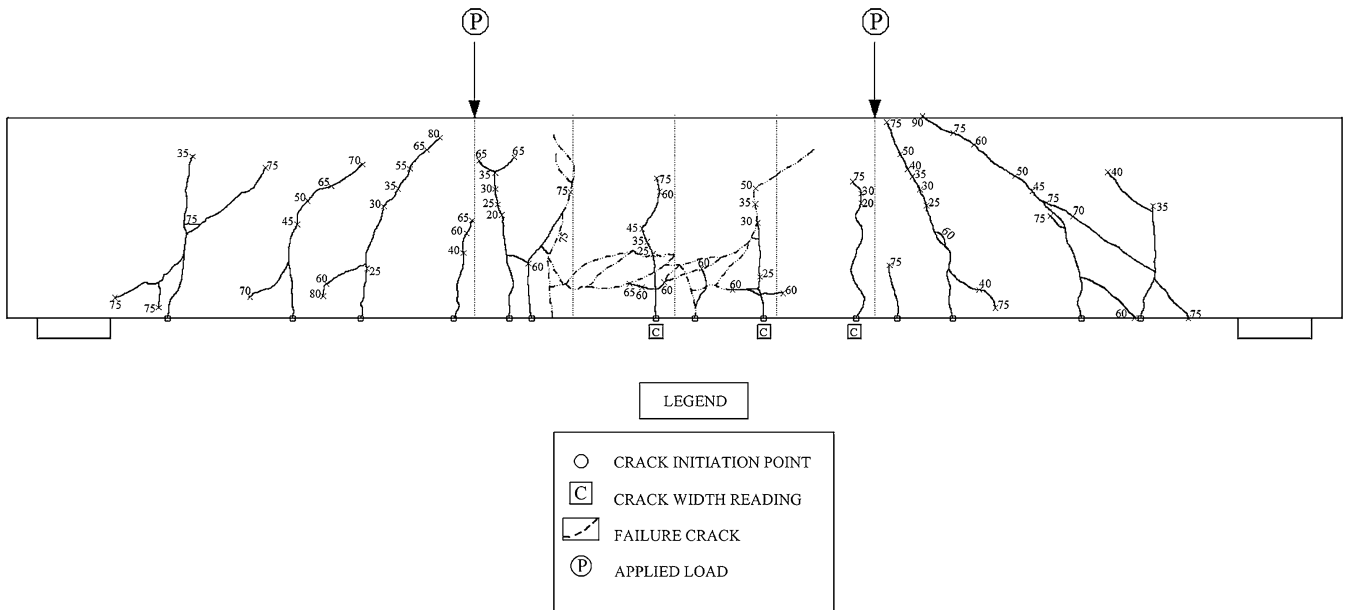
Side view of the crack pattern and mode of failure associated with beam (SCC-B-B1).
